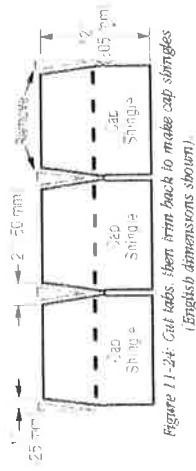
Cut tabs: trim trim back to make cap shingles (English dimensions shown).
